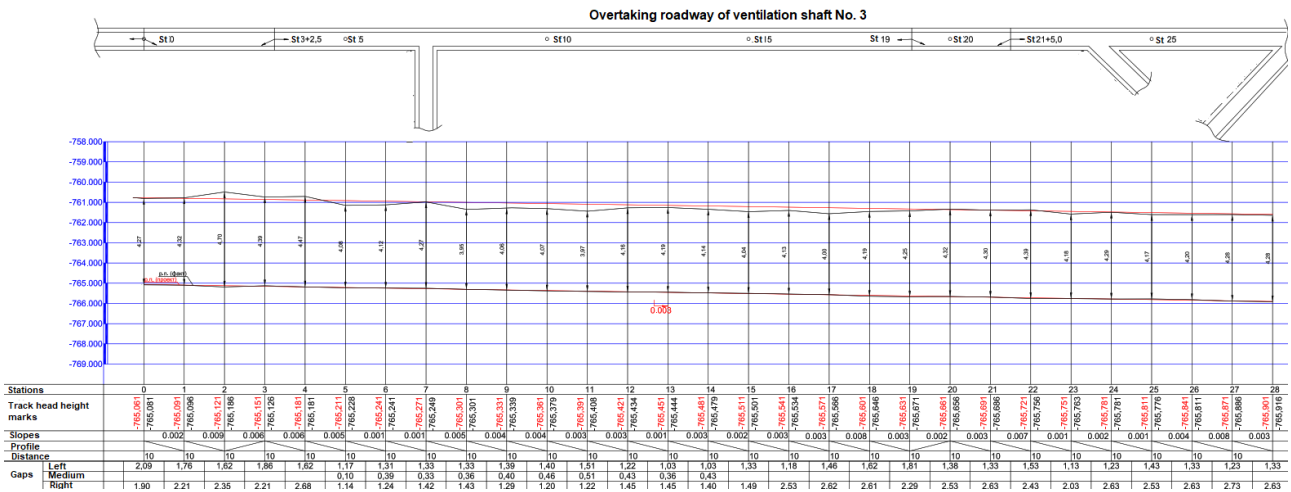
Overtaking roadway floor deformation profiles of the shaft yard 930 m horizon
